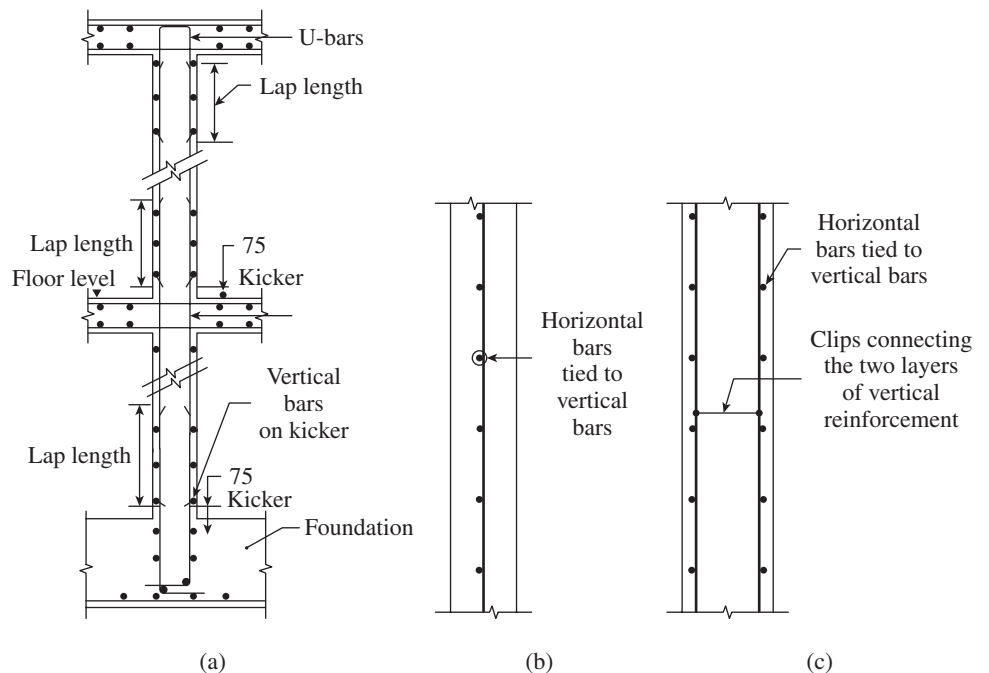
Detailing of wall reinforcement as per SP 34:1987 (a) General section through the wall (b) Vertical section of wall with single layer of reinforcement (thickness less than 170 mm) (c) Vertical section of wall with double layer of reinforcement
